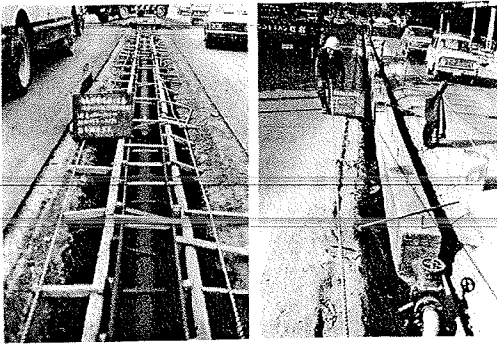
Pipeline being installed along centerline of road; water nozzles protrude from concrete.
